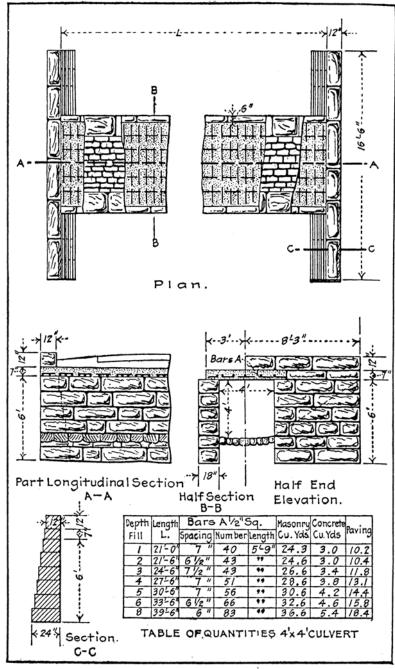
Typical masonry culvert. State of New Hampshire.
